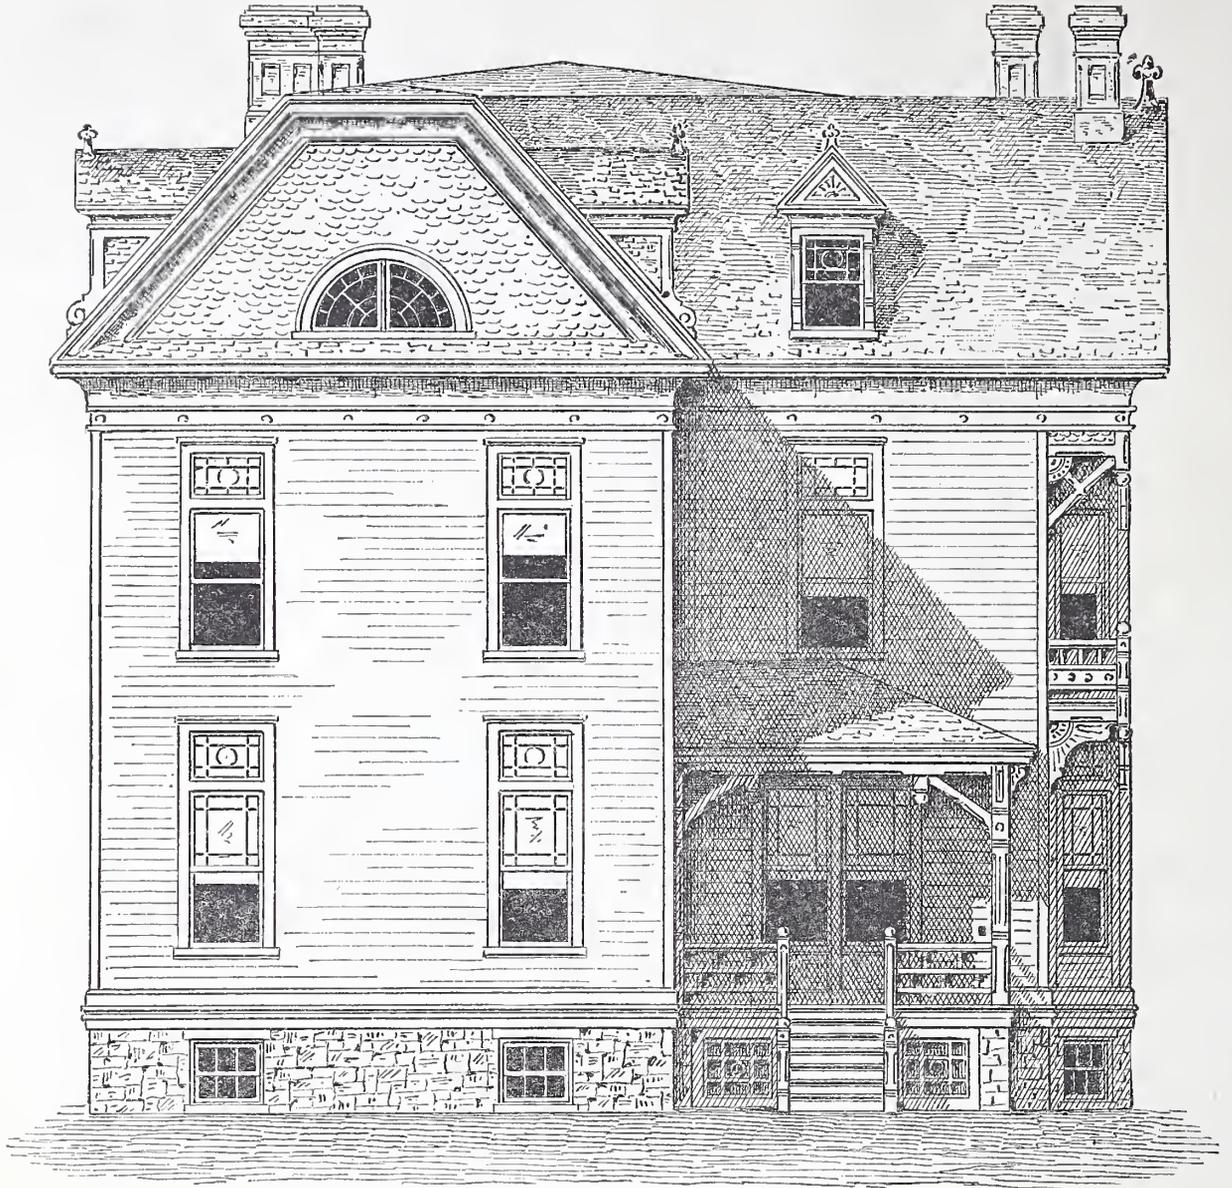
Rear Elevation.—Scale, 1/8 Inch to the Foot.
